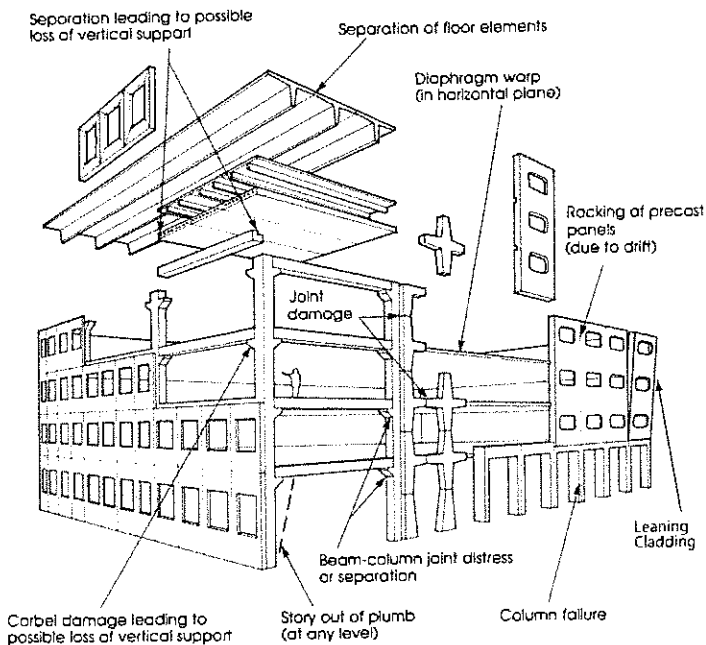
Inspection points for precast concrete buildings.
